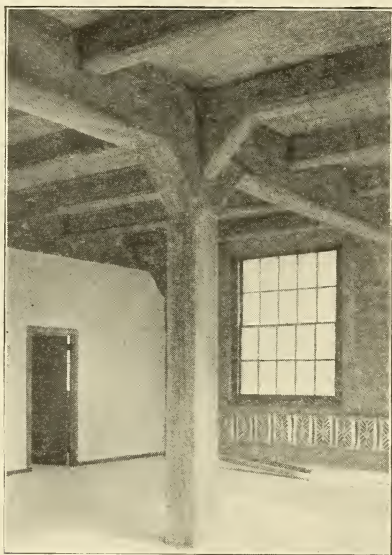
Floor Construction in Shop Building of Swarthmore (Pa.) College, Showing Connection of Girder Beams with Column.
